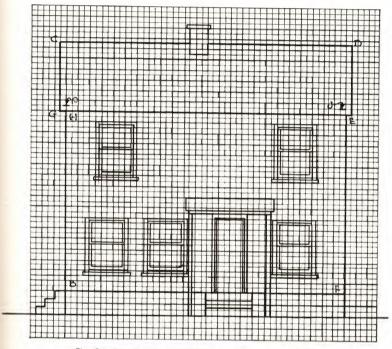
Rough Drawing of Elevation View on Graph Paper
